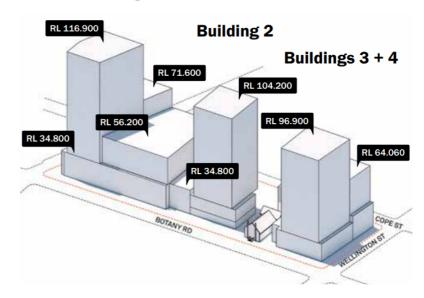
| 3D model of Concept Approval building envelopes (source: Applicant's EIS)
